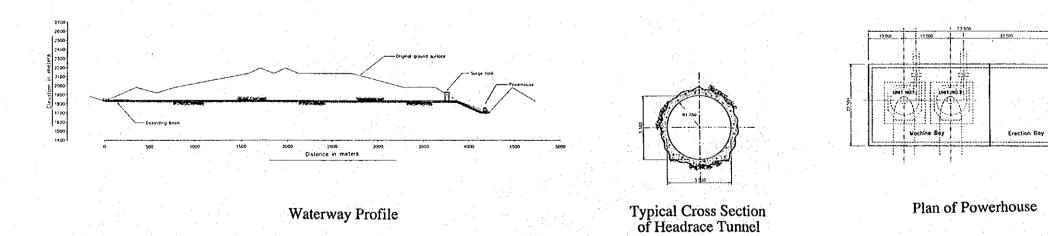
Preliminary Plan of MKR-2 Scheme
